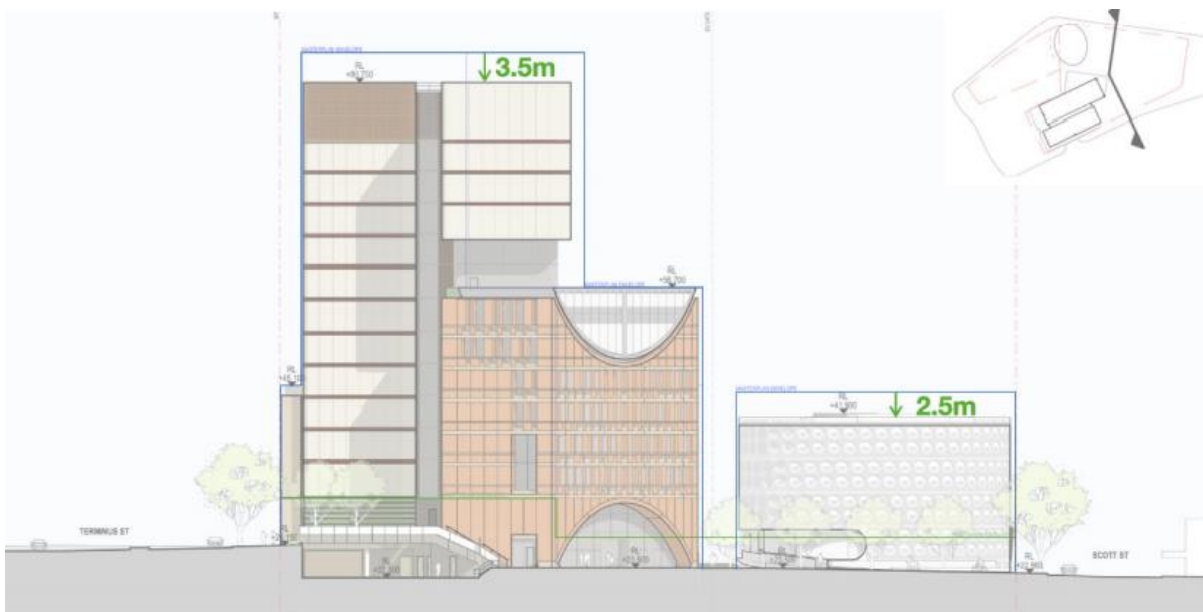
Envelope comparison elevation (Concept DA building envelope identified in light blue colour)
